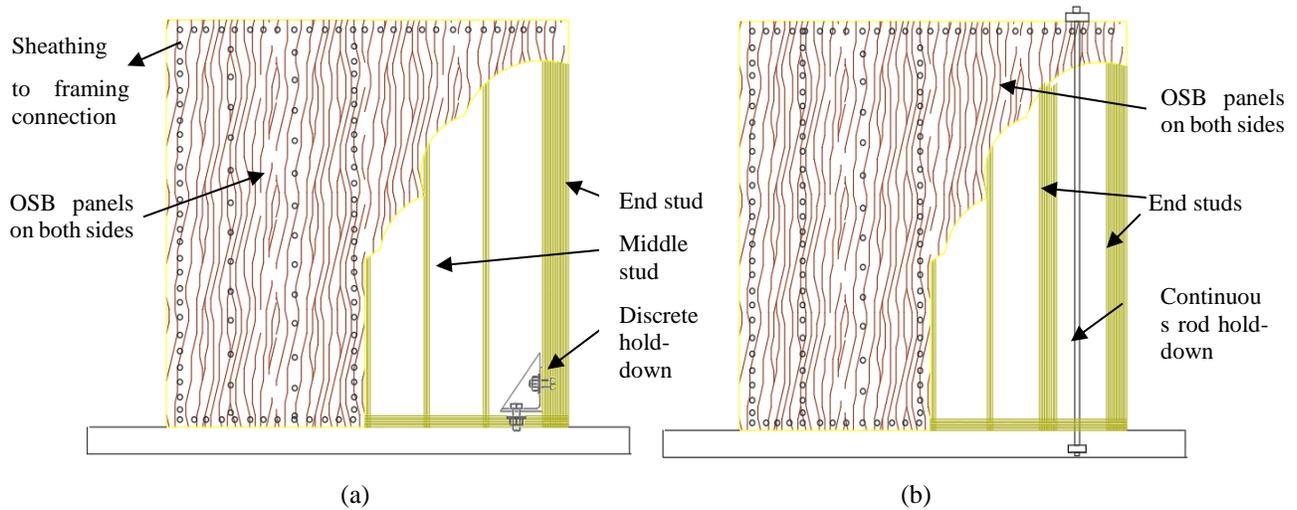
Configuration of (a) a wood frame shear walls with discrete hold-down, (b) a wood frame wall with continuous rods (reproduced with permission from [1], [2])
